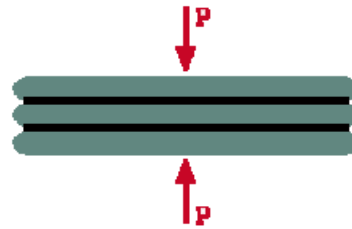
Laminated Elastomeric Bearing with Mounting (Sole) Plates
